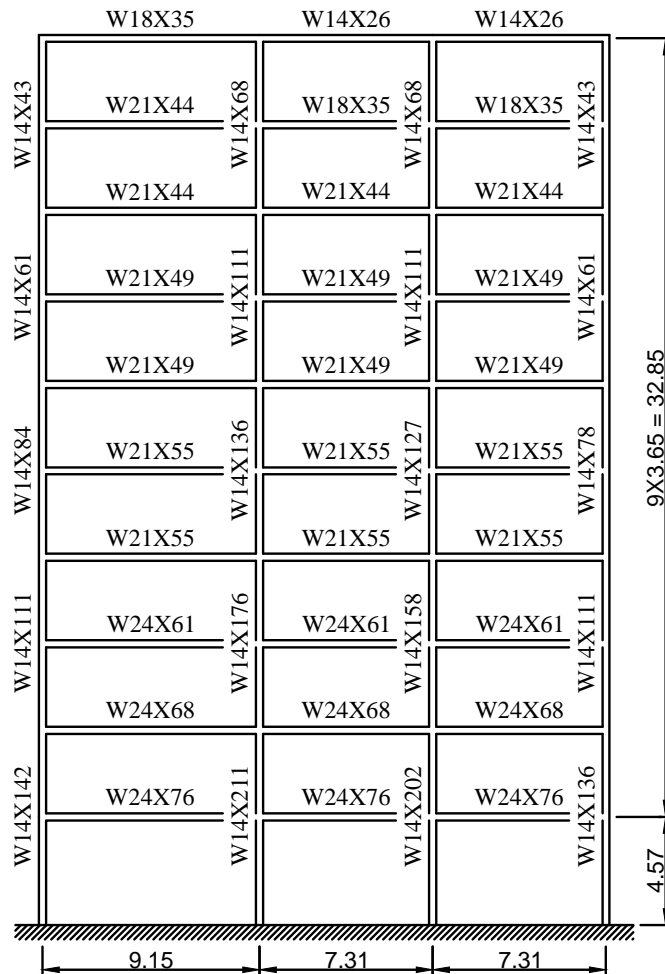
Planar steel frame (dimensions in m): Adapted from [25]
